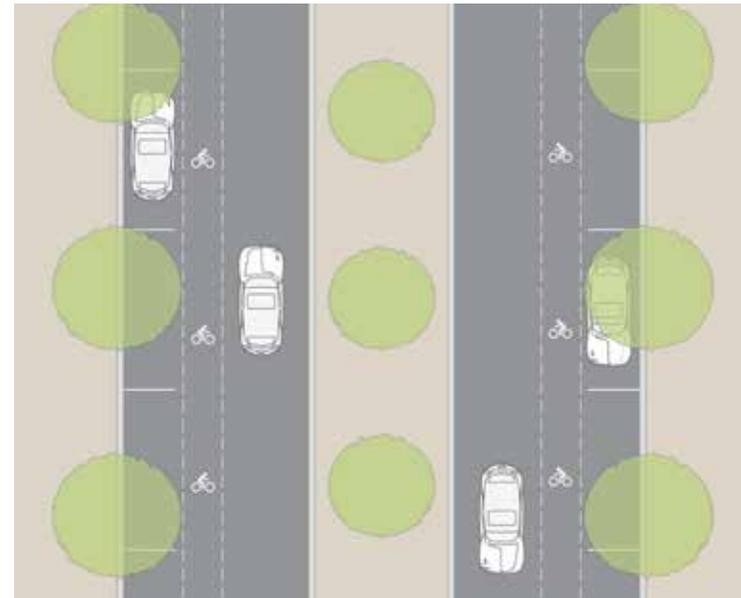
ALTERNATIVE ROAD CROSS-SECTION TO ACHIEVE WIDER FOOTPATHS
